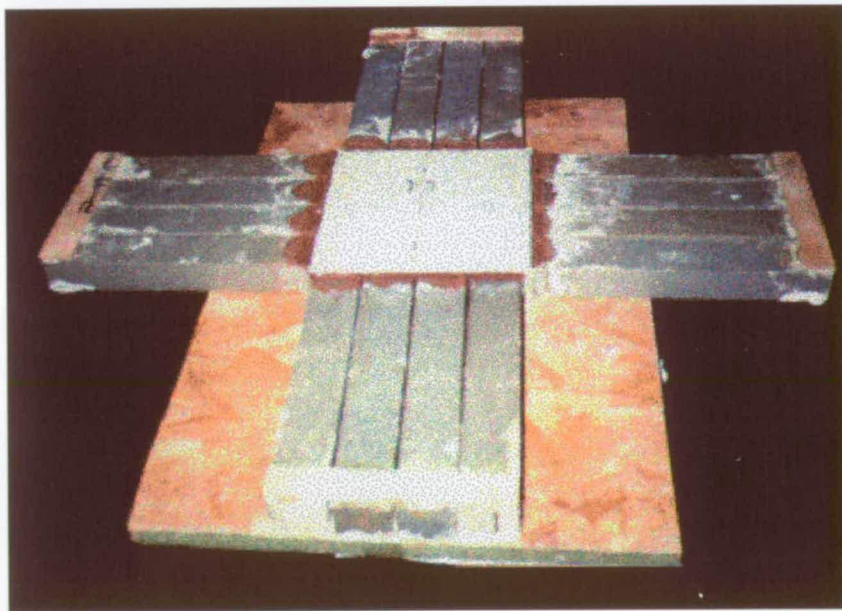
Mortar Cross Beam: Arms are Glued to the Central Portion and Ready for Testing
